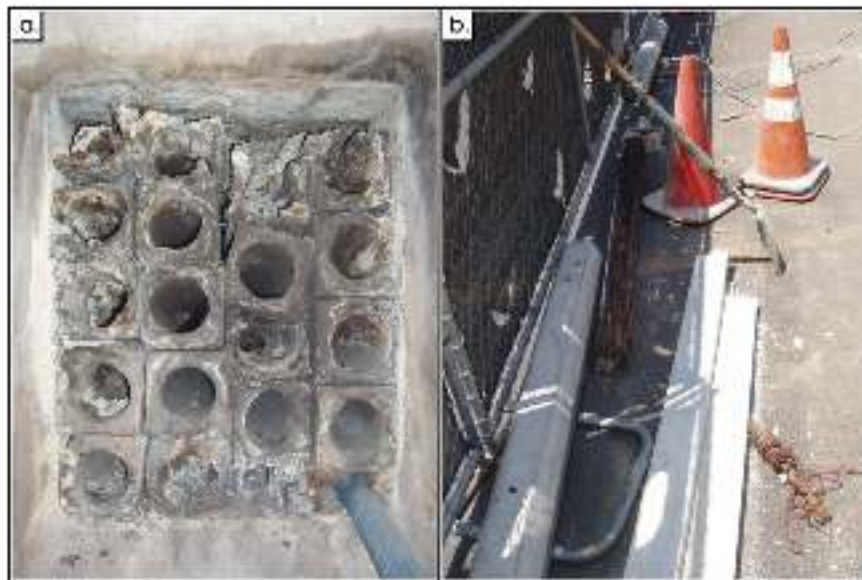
Wooden electrical conduit housing: a.) bank of cypress pipes buried under street level; b.) close-up of individual segment.
